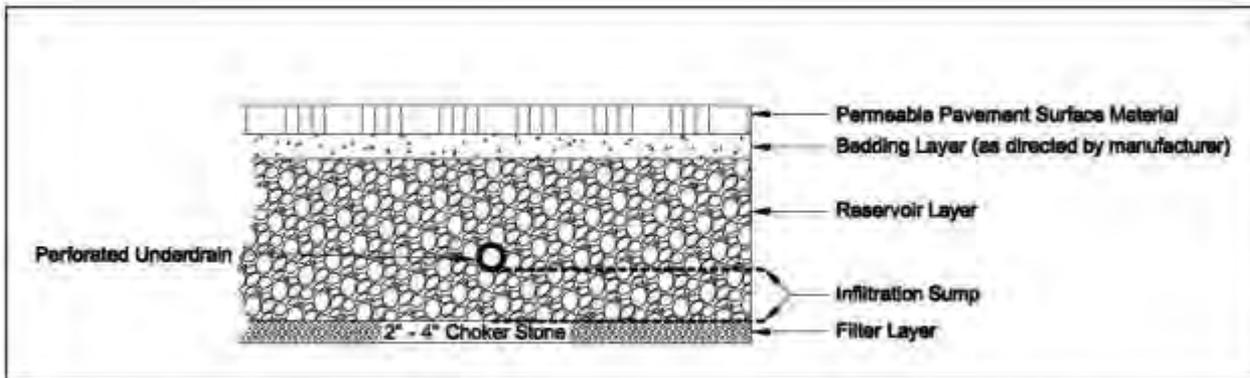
Cross section of an enhanced permeable pavement design with an underdrain.
